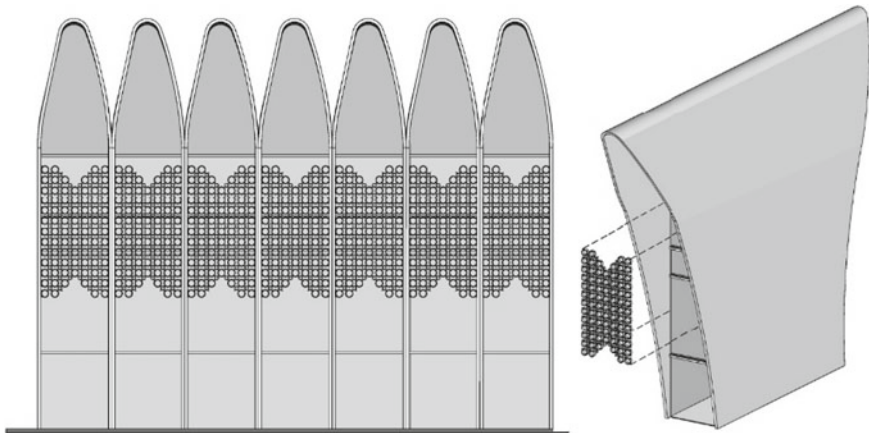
The concrete barrel vault of the Entrance Hall connecting Wisma Angkasapuri and Television House. The glazed façade allow for an abundance of natural light while a metal grill in repetitive circular patterns protect the glass from direct sunlight
